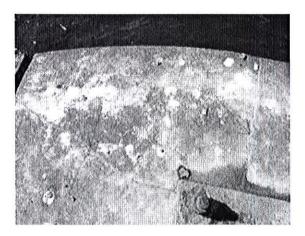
Photo 42 (see Appendix D page 33) showing the cracked top stone confined by the most likely ASR expanding protruding concrete.
